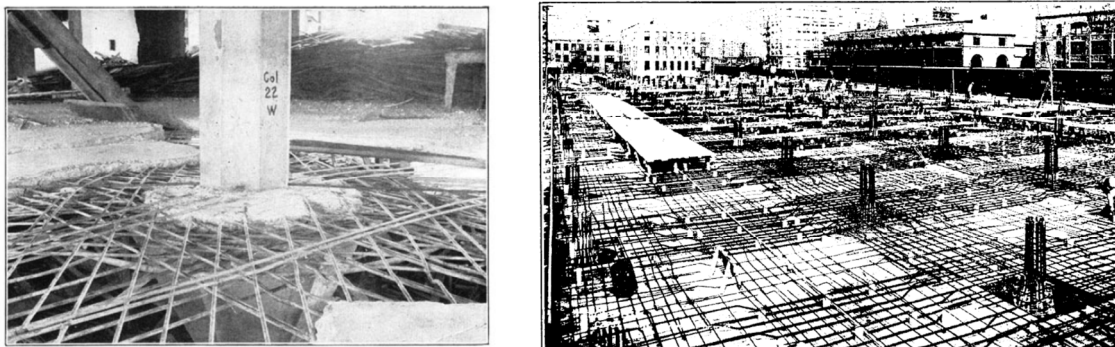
Longitudinal reinforcement layout in the case of (a) a four-way slab system (concrete removed after testing) (Talbot and Gonneman 1918) and (b) a two-way slab system (before casting) (Condron 1913)
